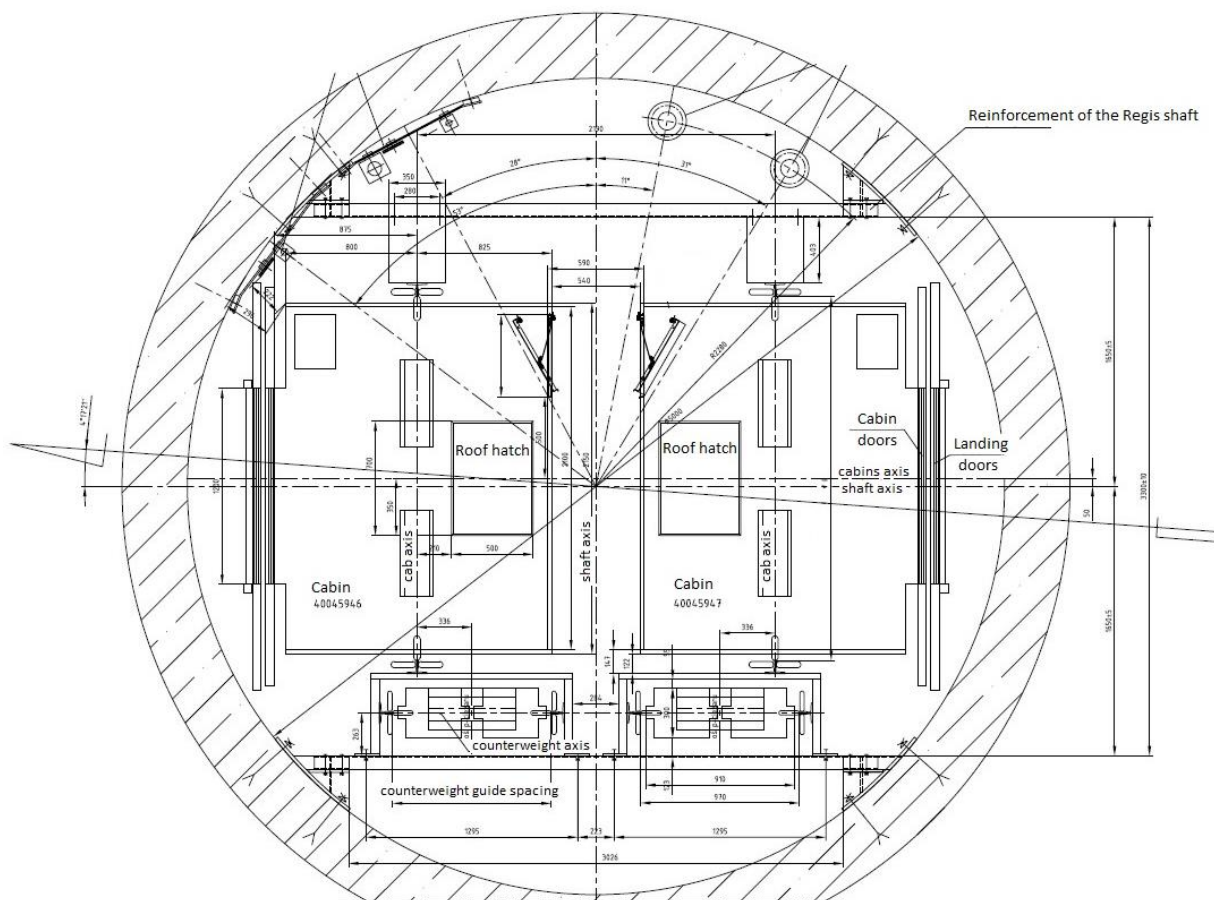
Cross-section of the Regis Shaft with wall-mounted equipment [5]
